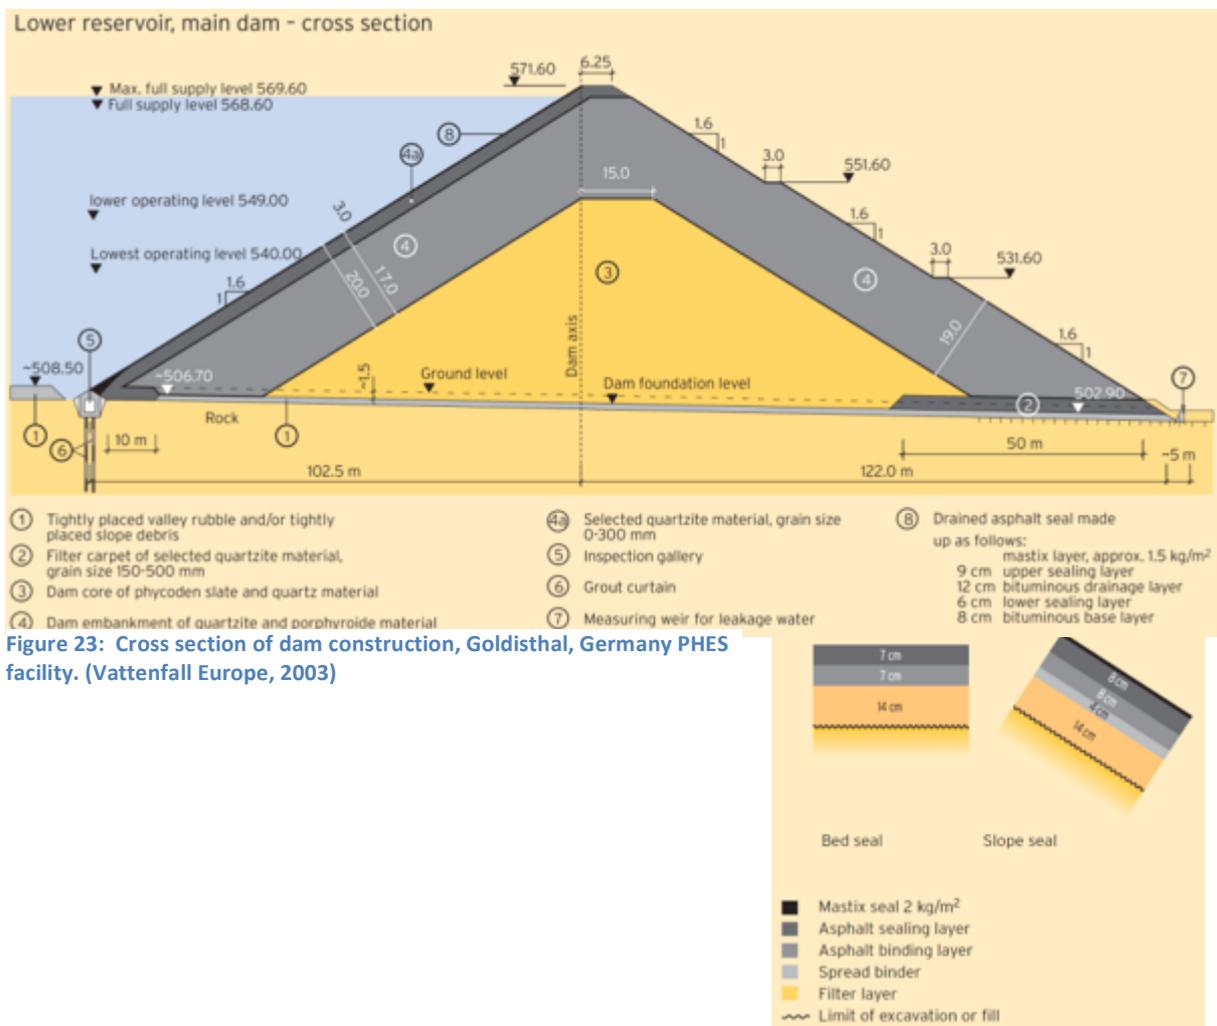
Cross section of dam construction, Goldisthal, Germany PHES facility. (Vattenfall Europe, 2003)
